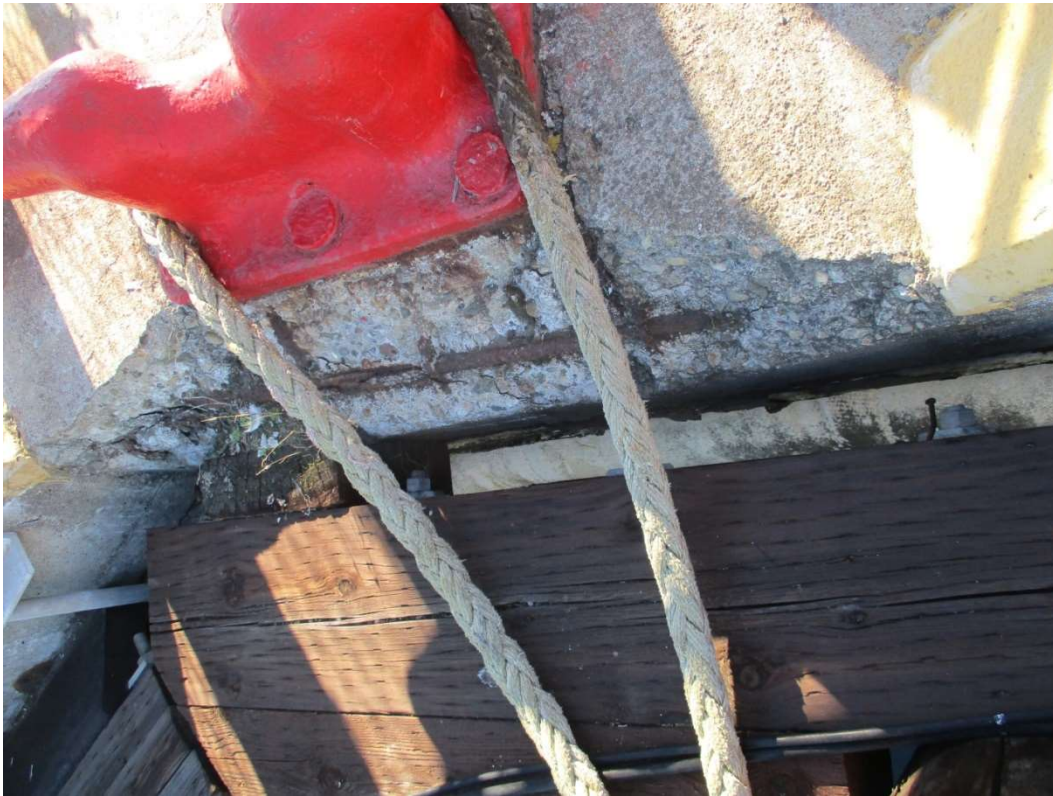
Corrosion spalling of deck edge at Pier 3
